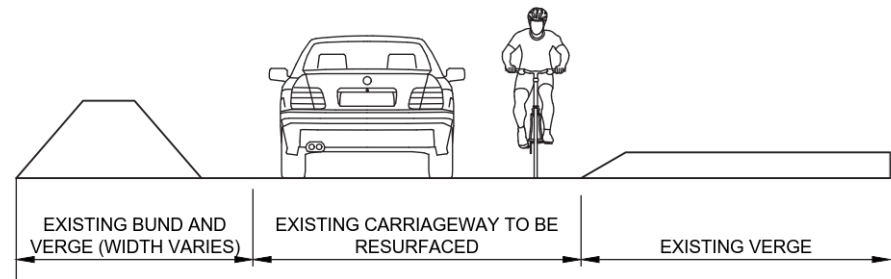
Cross Section Route 3 – Existing Road between Existing Informal Path and B1348
